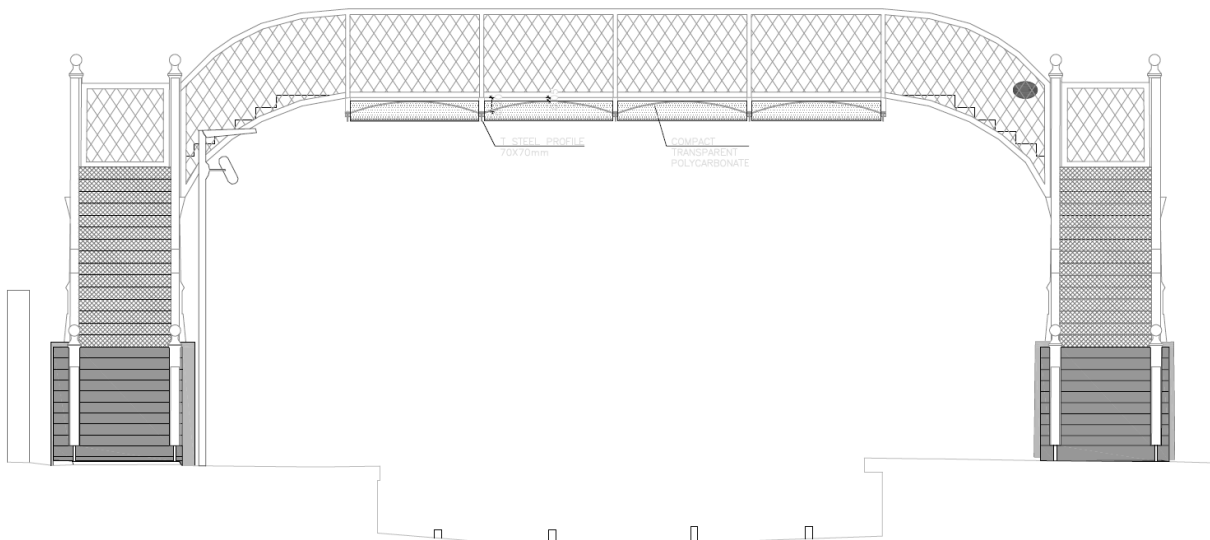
Proposed parapet solution at OBG12 Clonsilla station footbridge - elevation
